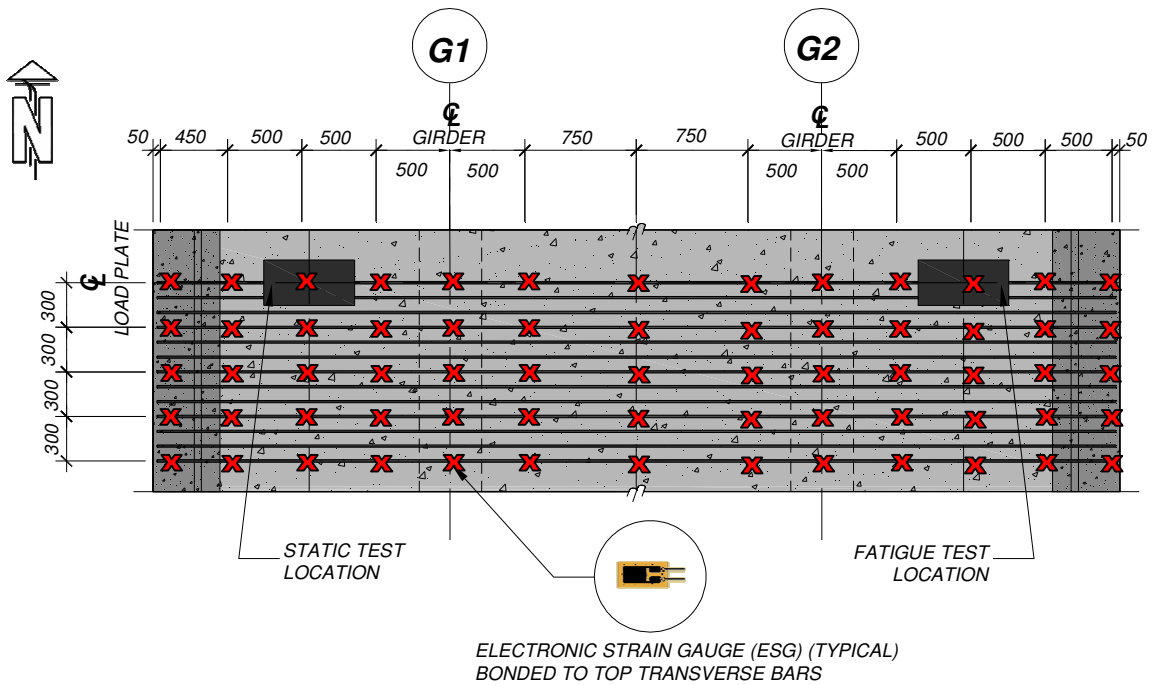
Schematic illustrating top transverse reinforcing bar strain gauge locations for the cantilever section with steel reinforcement
